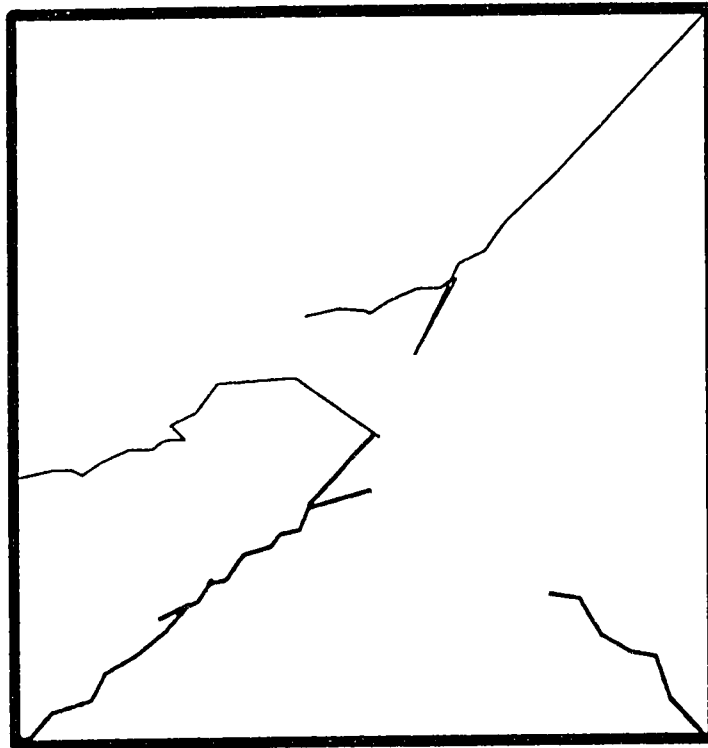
Typical Plastic Shrinkage Cracks in the Concrete Specimens Exposed to a RH of 25 %, Temperature of 45 °C and a Wind Velocity of 15 kmph
